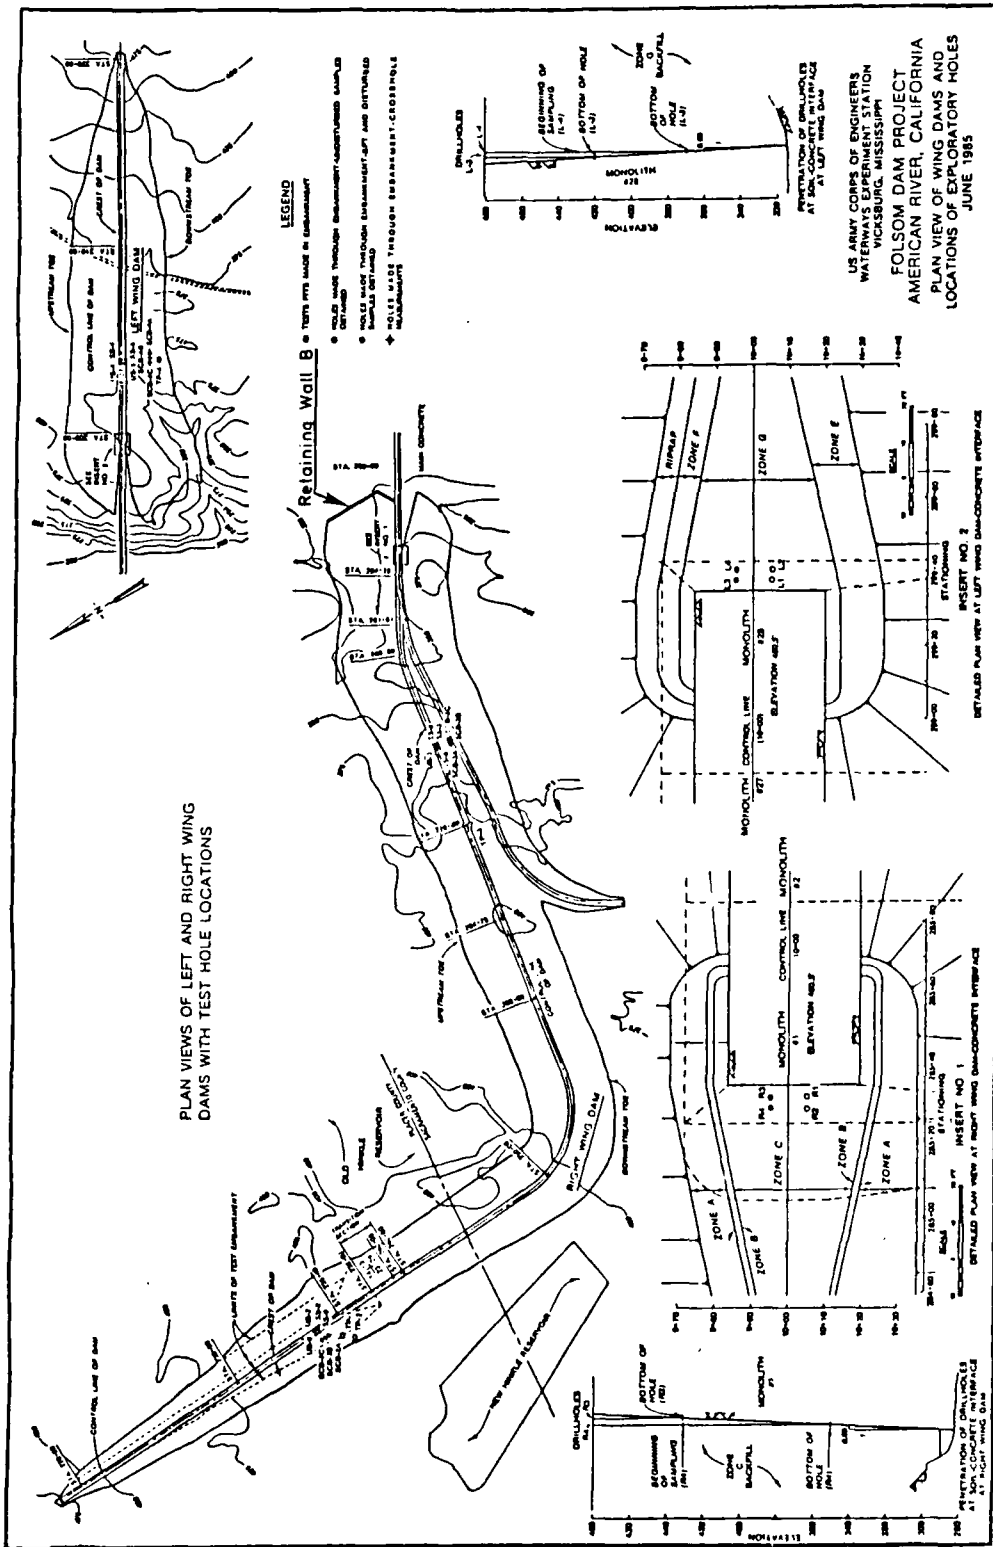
Plan view of Right and Left Wing Dams and detailed plan view of interface areas
